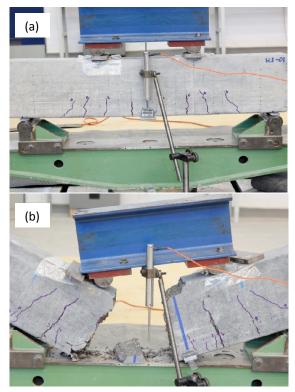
RHSC beam with typical (a) flexural cracking, and (b) ultimate failure
